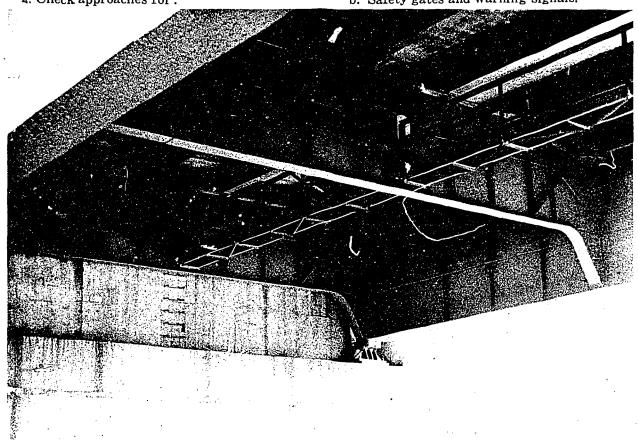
Inspection catwalk and handrails under girder bridge. Note access ladder on backwall.
